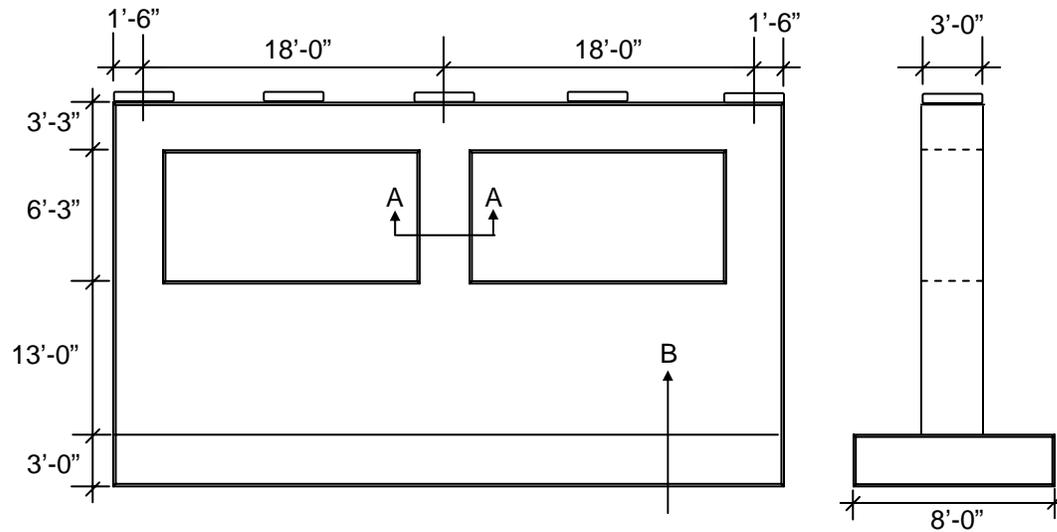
Dimension of the substructure of the US68-US62 connector bridge.
